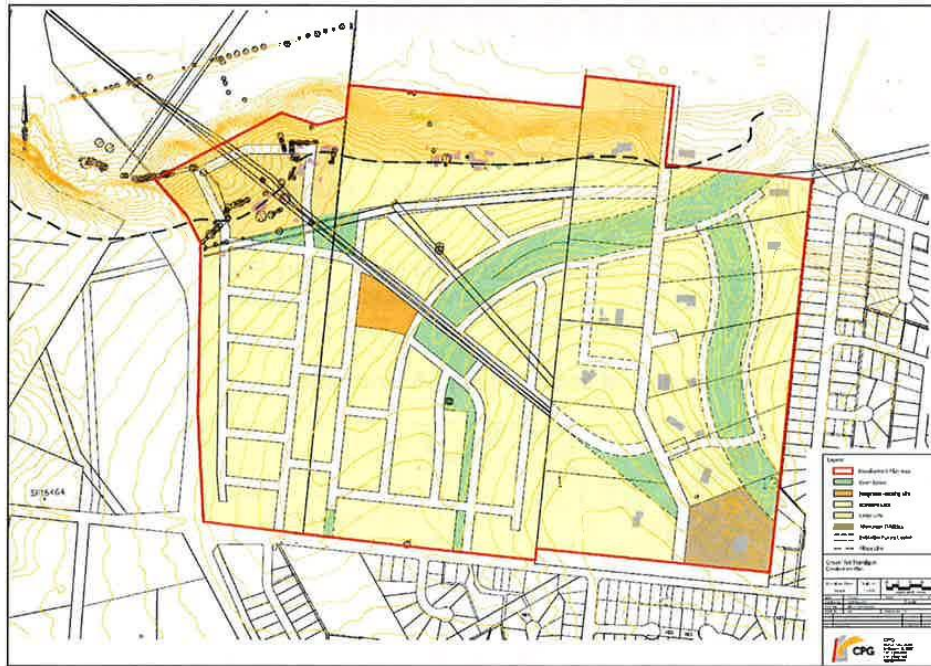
Site plan (CPG, version 1, dated 07/12/11)
